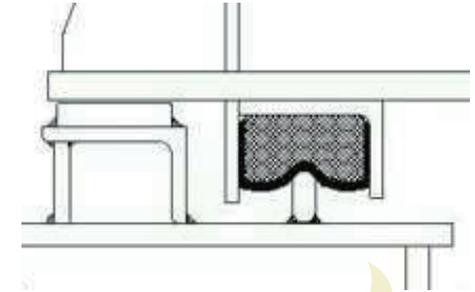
Bearing pad wear will result in overcompression of the packing rubber.
